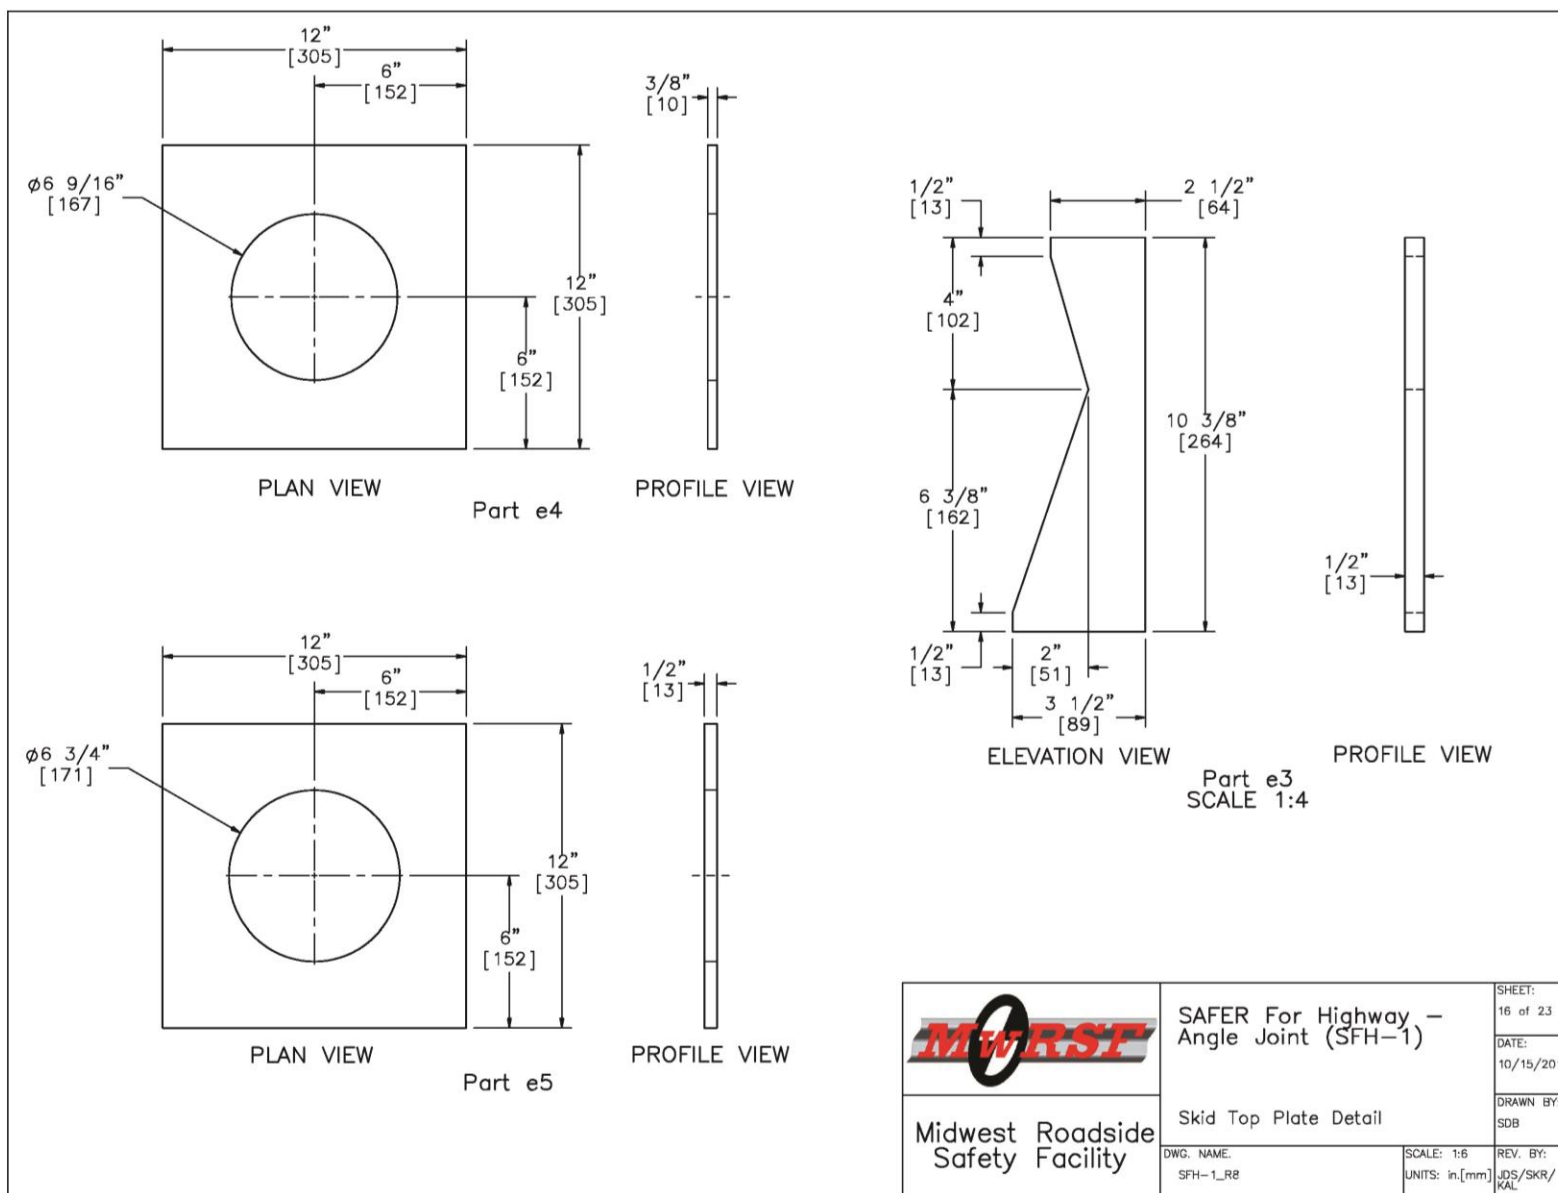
Recommended Barrier Design for Full-Scale Crash Testing, Skid Top Plate Detail
